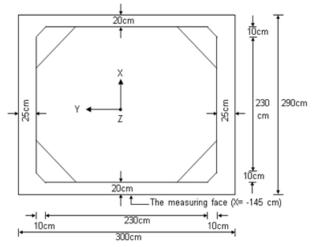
Plan view of the box culvert formwork (h = 97 cm)
